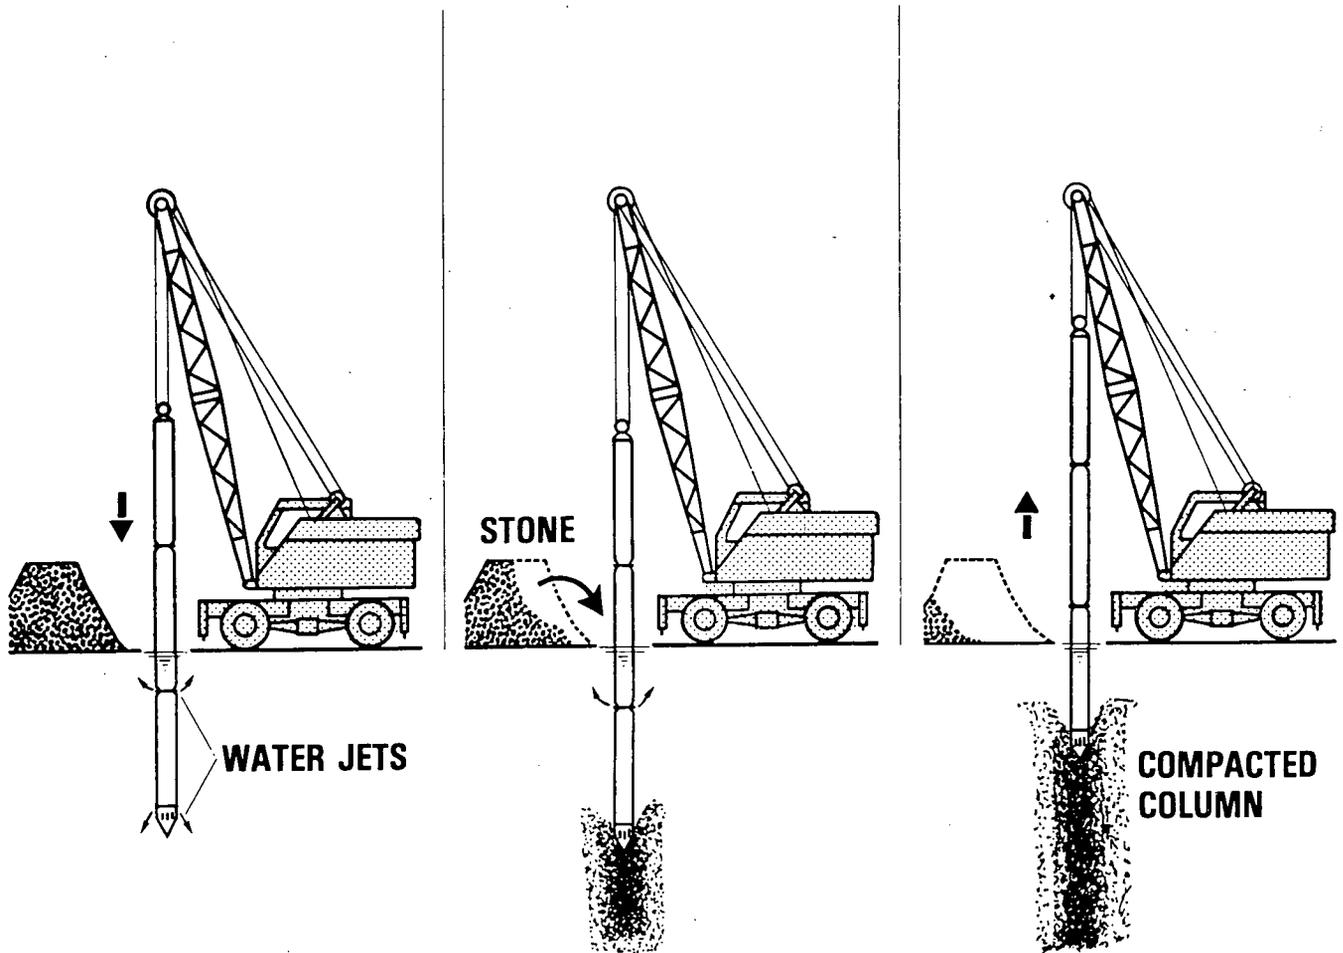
Stone columns constructed by vibroreplacement (133).
